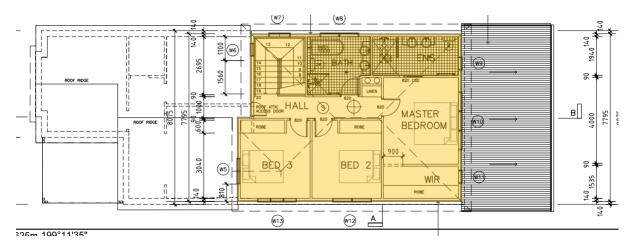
Proposed 2nd floor layout (Source: Fedele Design P/L)
